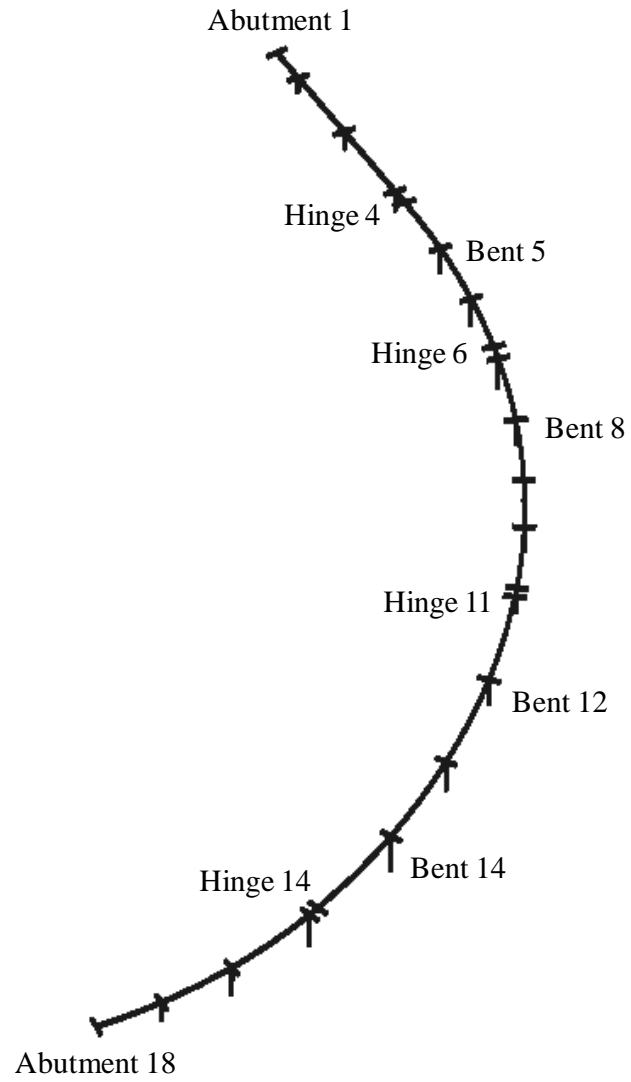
3D view of the South-East connector (foundations are not shown)
